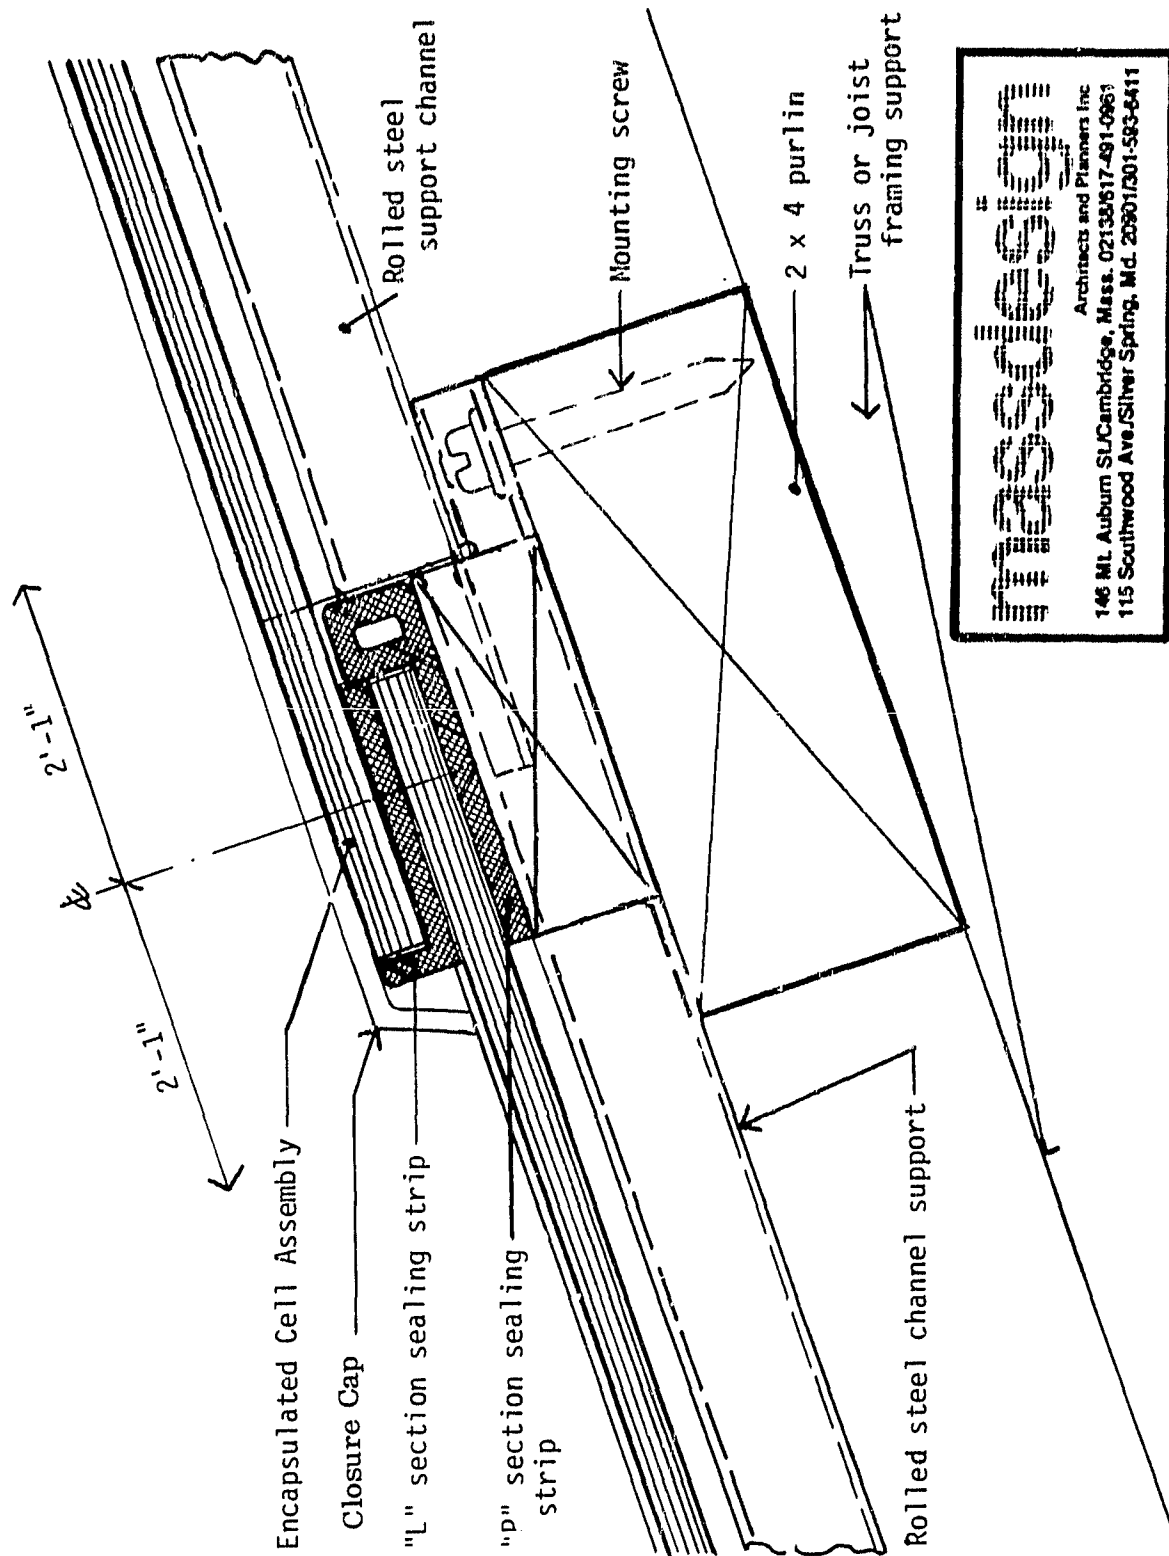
through 3-36 show the installation details which pertain to the integral mounting approach. As depicted in Figure 3-32 the modules are mounted to a system of horizontal purlins which provide the lateral support between the roof trusses or joists. The joint between overlapping modules is supported by wooden blocking which is nailed to the purlins at 25 inch spacing up the roof. A high-tack, pressure-sensitive adhesive on the underside of the "L"-shaped rubber extrusion provides a bonded seal in the overlapped area as an extra protection against water leakage.
